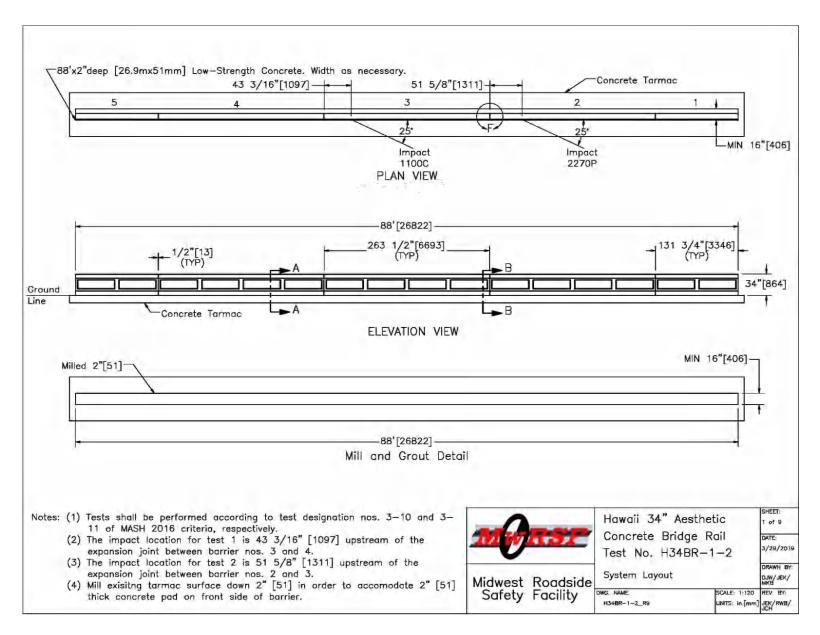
Test Installation Layout, Test Nos. H34BR-1 and H34BR-2
